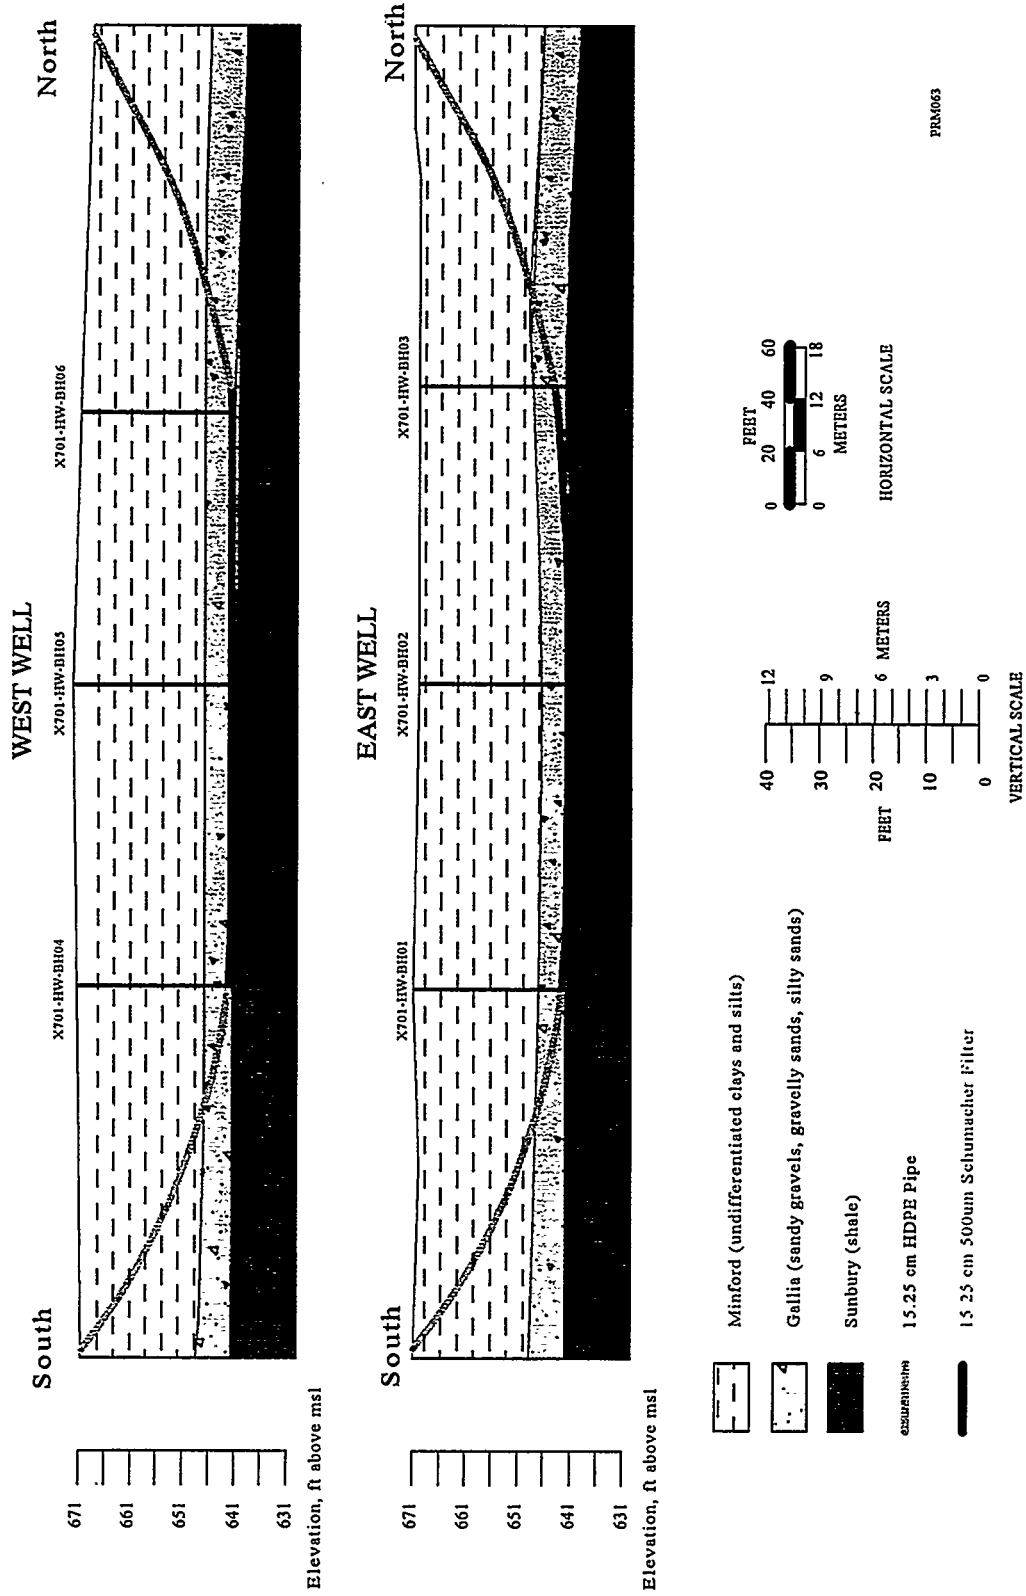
Geologic cross sections at the locations of the horizontal wells.
